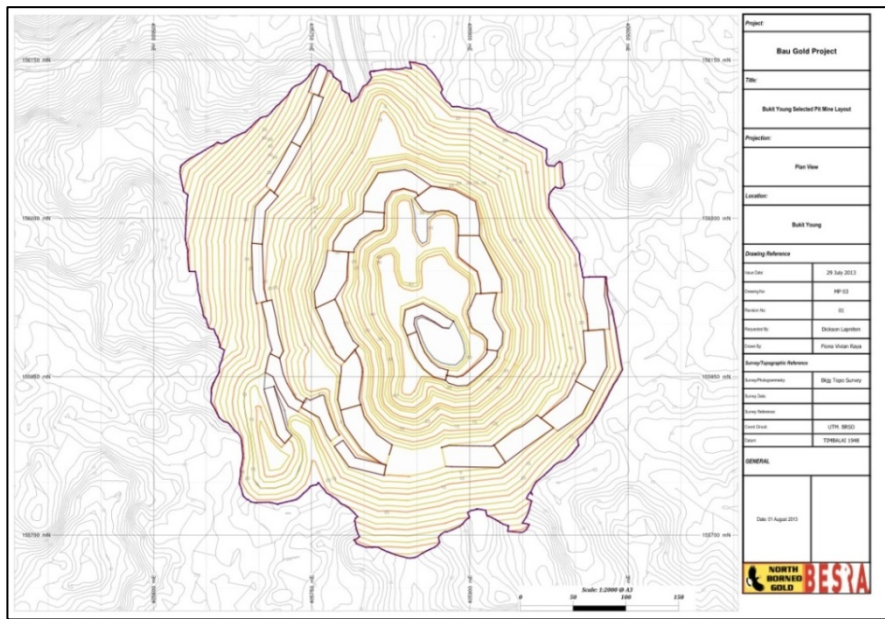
BYG-Krian: Plan View Pit Design Layout
